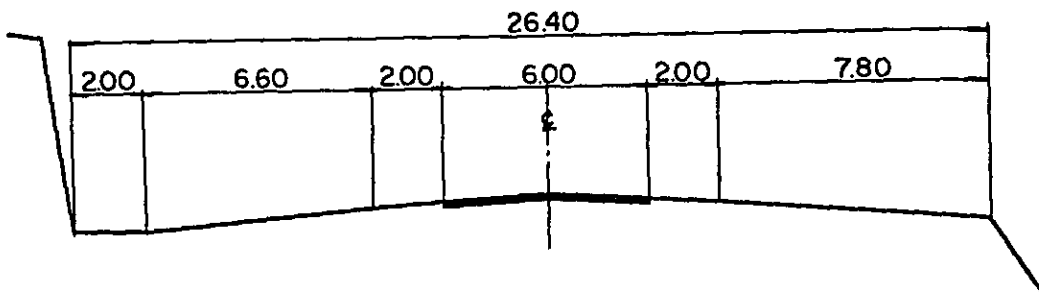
Typical Cross Section of Existing Road (Cont'd)
